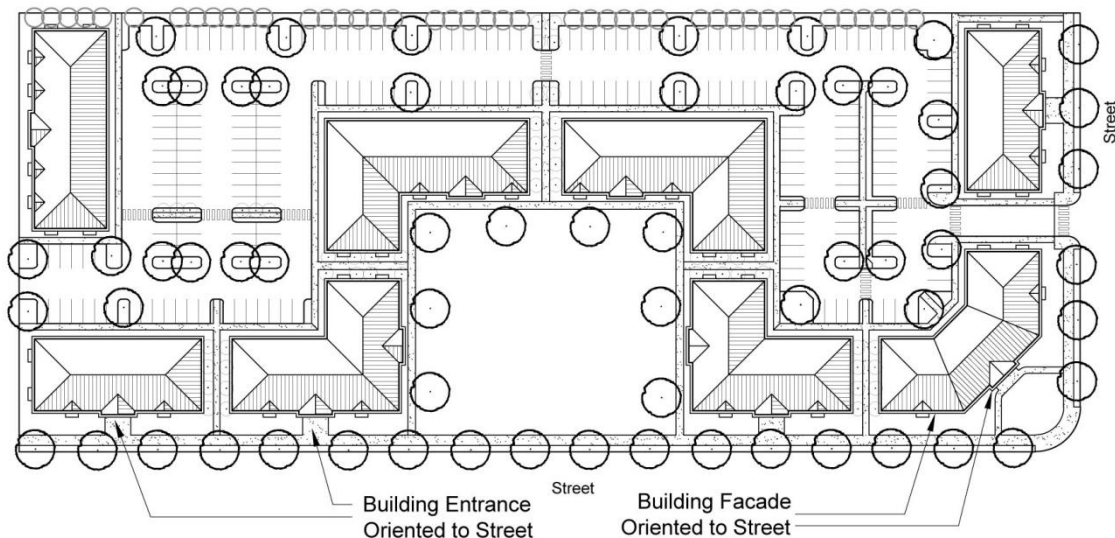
(b).4 – Site Layout – Building Orientation
